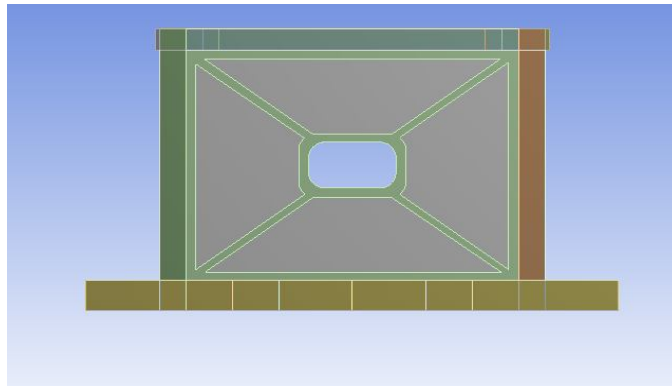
Stiffened SPSW with Opening and Stiffeners Configuration EOD1
